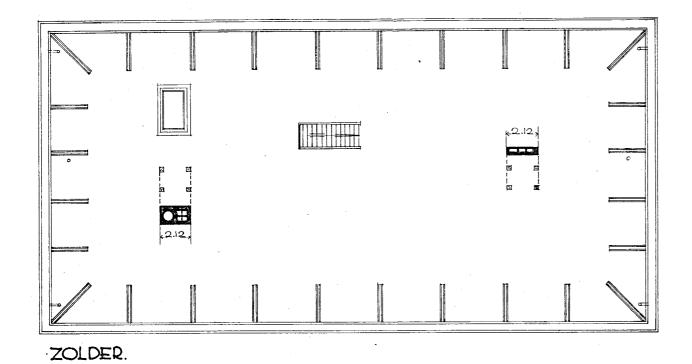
Floorplans 1:200, including construction (Gemeentewerken Rotterdam, n.d.)
